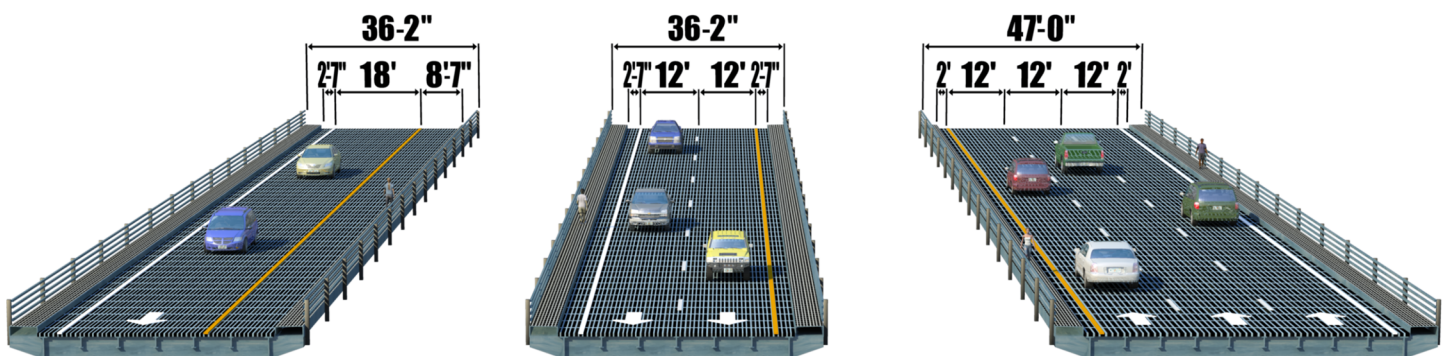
Typical Section for Existing S.R. 401 Bridges
